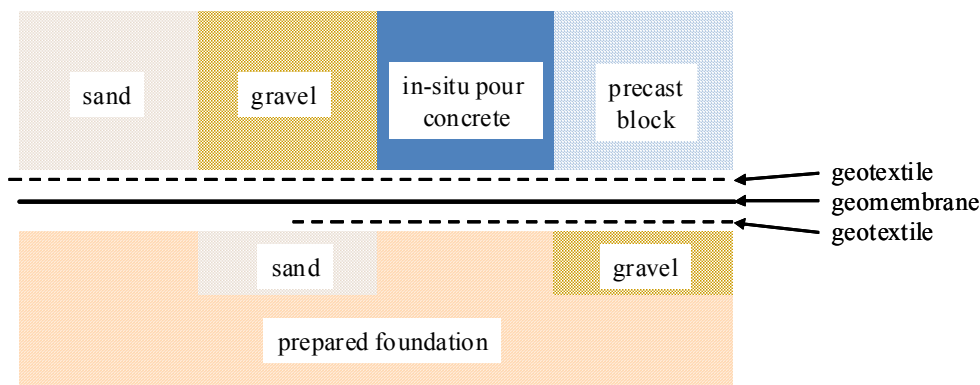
Example of lining systems for road runoff ponds (Adapted from SETRA & LCPC 2000)
